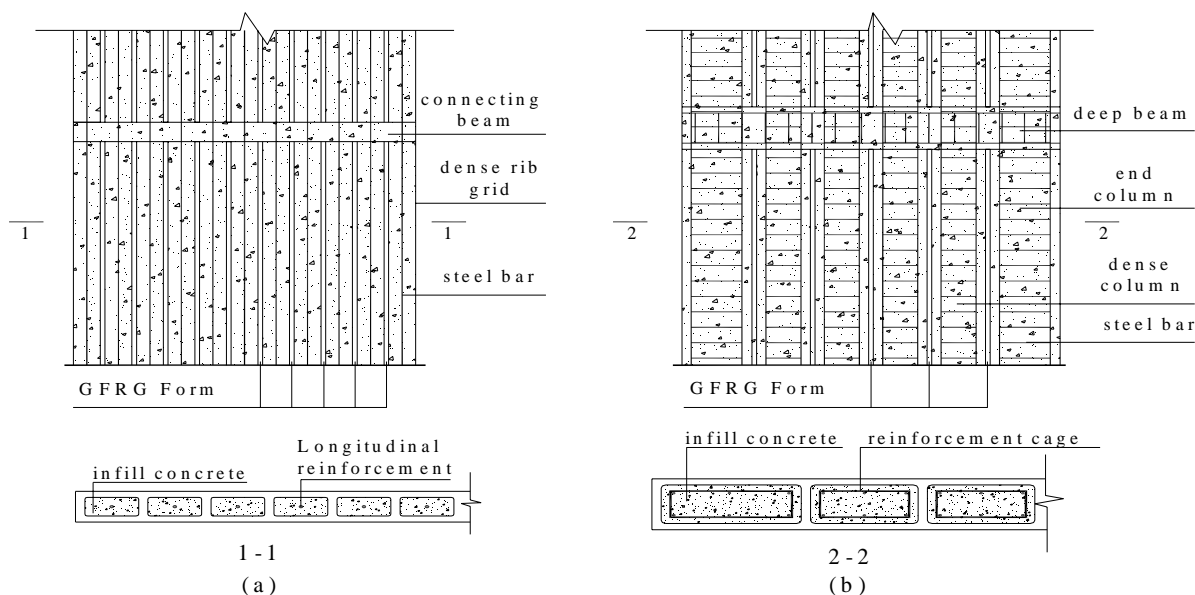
GFRG wall filled with concrete (a) and M-GFRG reinforced concrete wall (b)
